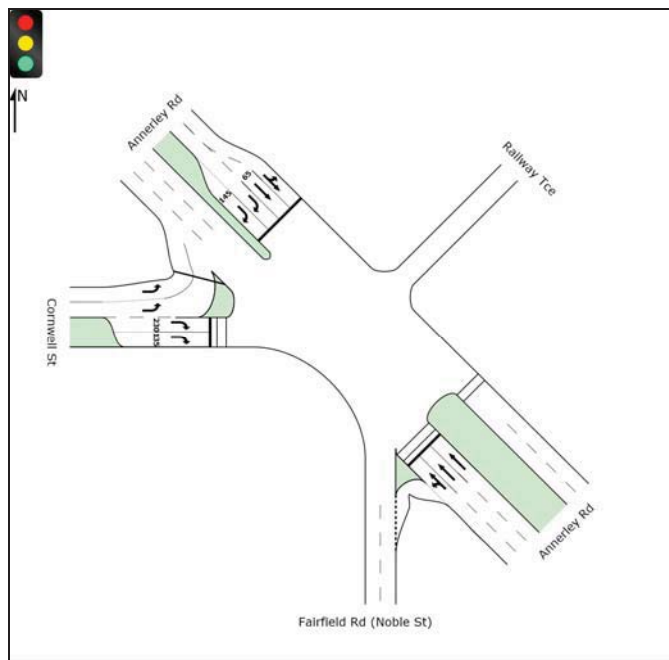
Annerley Road/Fairfield Road/Cornwall Street
